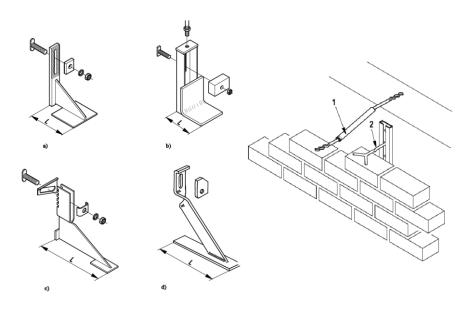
Examples of brickwork support brackets and movement-tolerant wall ties [xxx].
